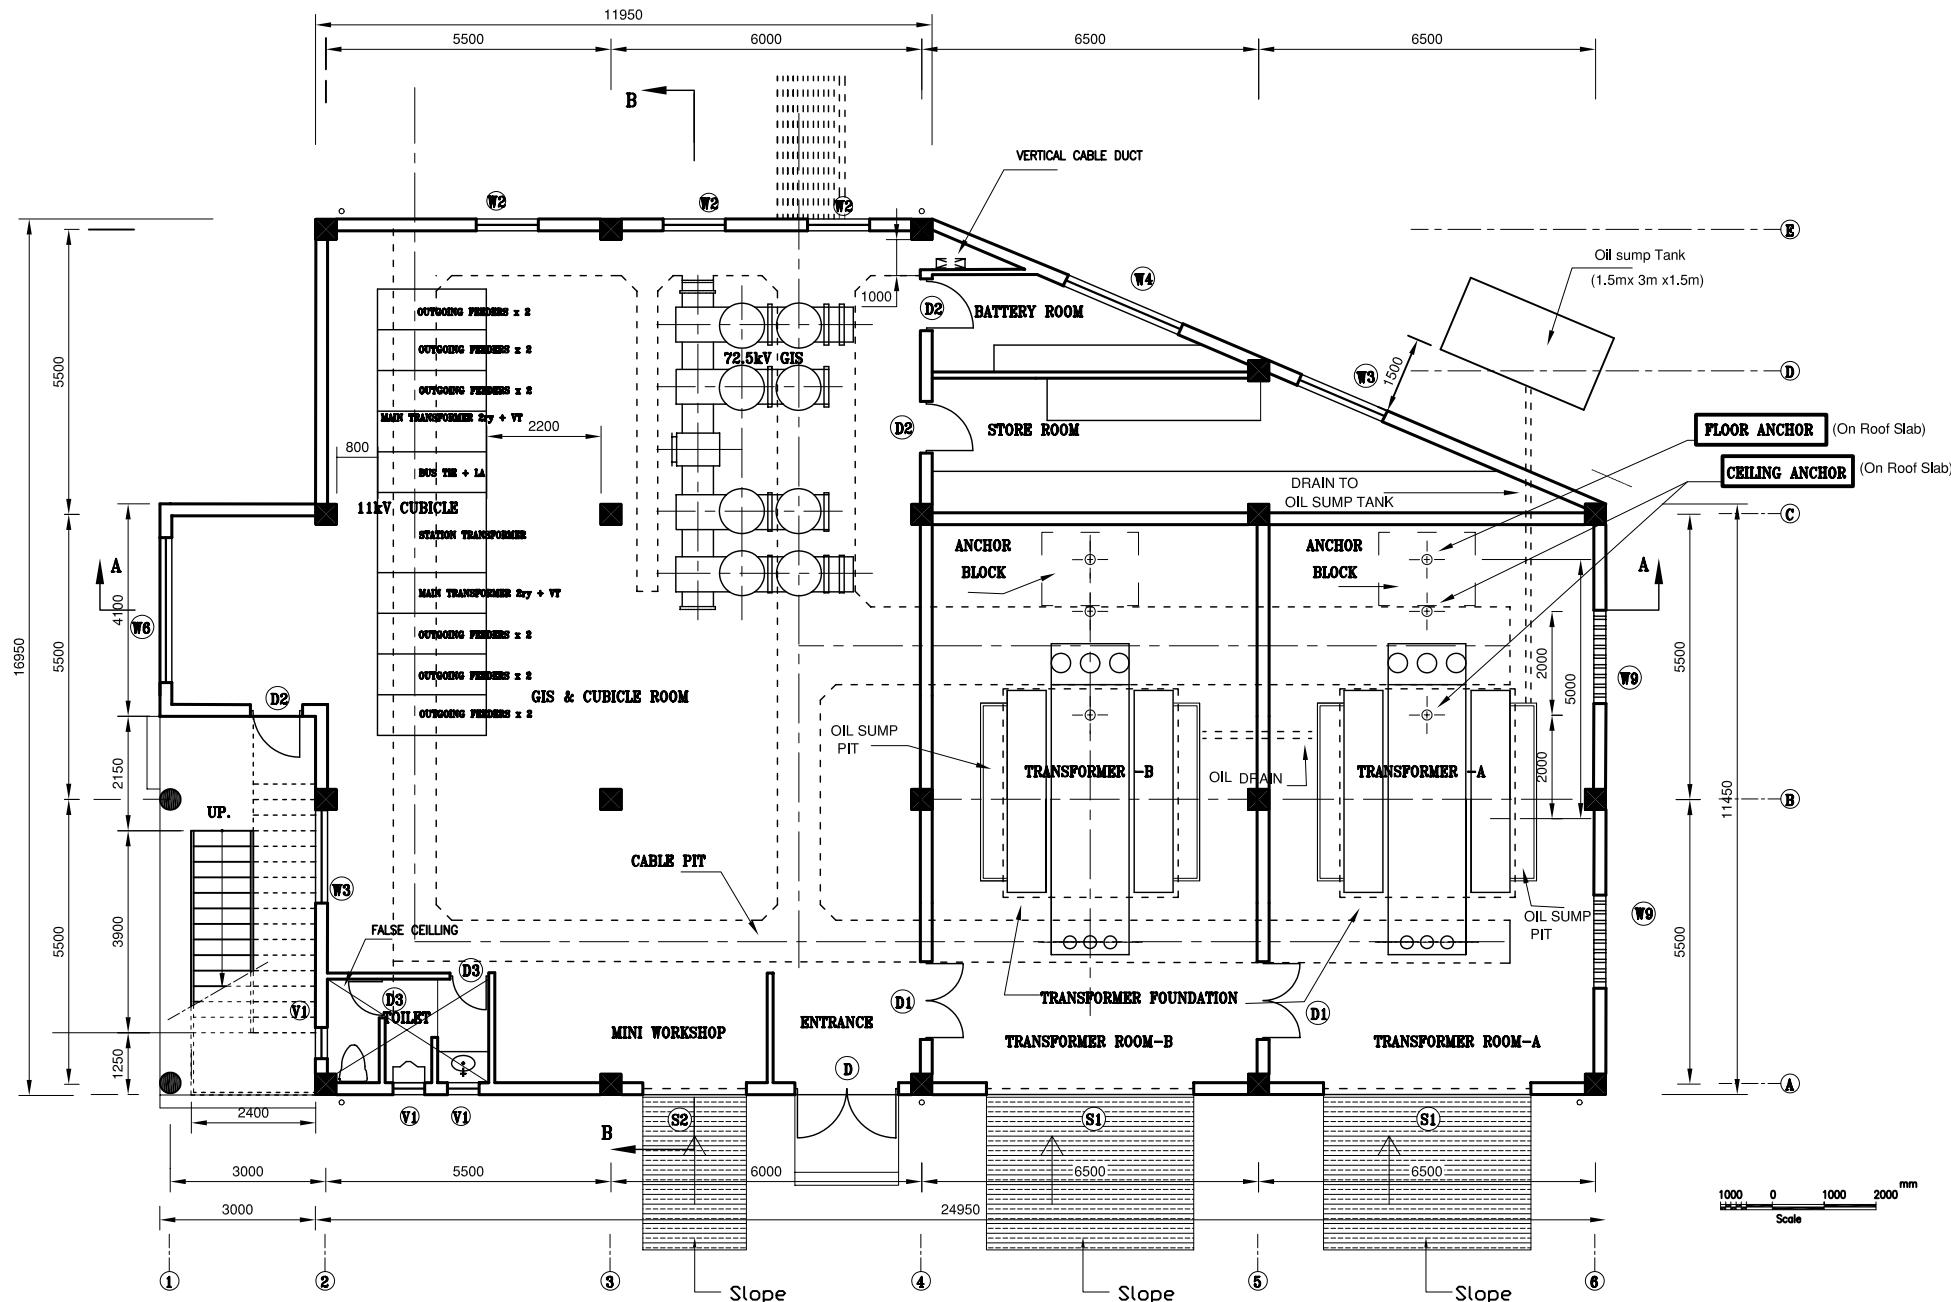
K3 S/S Ground Floor Plan (GIS, Cubicle and Transformer Room)
